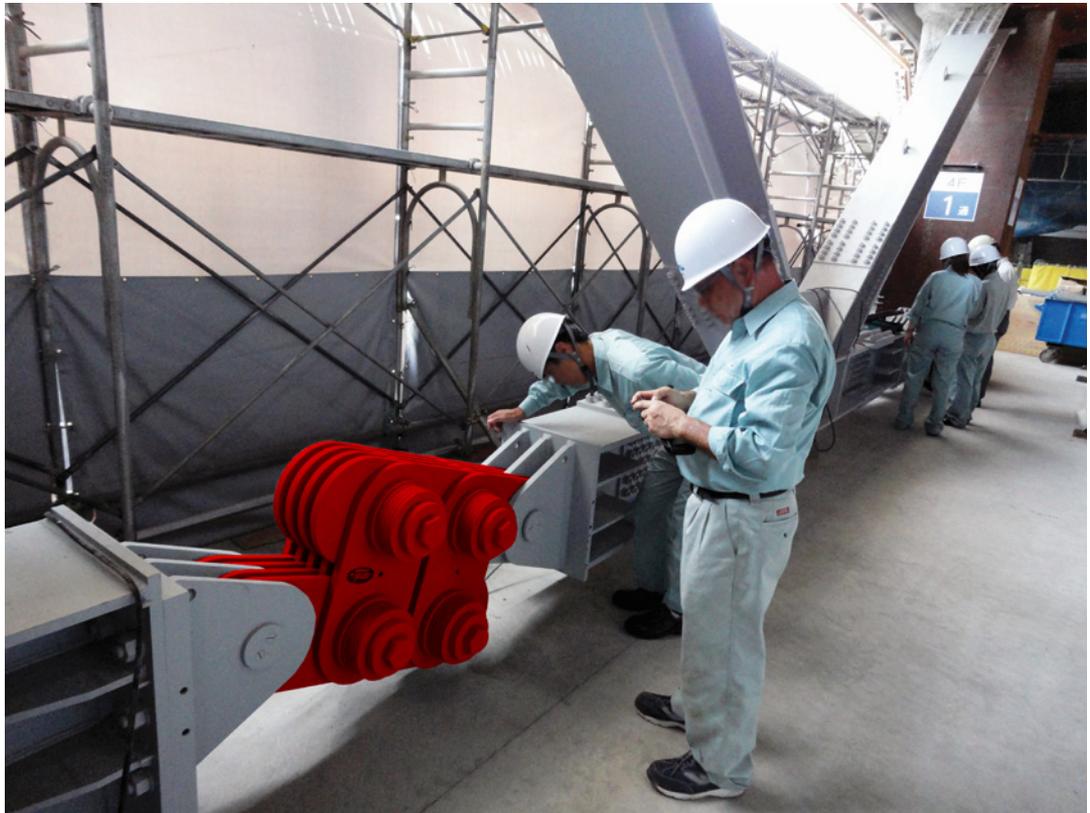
Earthquake dampers reduce the movement of a building like a shock absorber reduces road bumps in a car.
